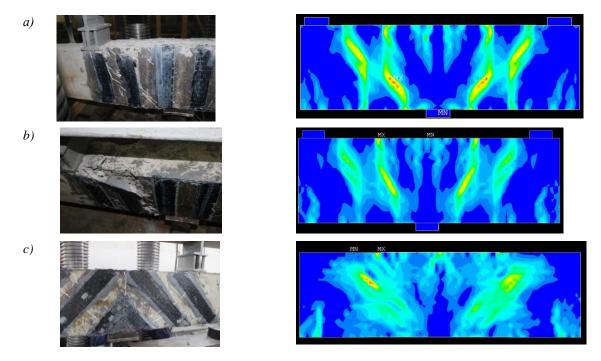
Shape of the critical oblique crack in the physical specimen and in the finite element model (reinforced beam): a) the beam without confinement reinforcement strengthened by the carbon fiber-reinforced plastic stirrups with 50 mm in width, rod spacing equal to 110 mm at angle 90° , b) the beam with the confinement reinforcement rod spacing equal to 110 mm and carbon fiber-reinforced plastic stirrups reinforcement with 50 mm in width and rod spacing equal to 100 mm at angle 90° , c) the beam with the confinement reinforcement rod spacing equal to 110 mm and carbon fiber-reinforced plastic stirrups reinforcement with 50 mm in width and rod spacing equal to 100 mm at angle α .
